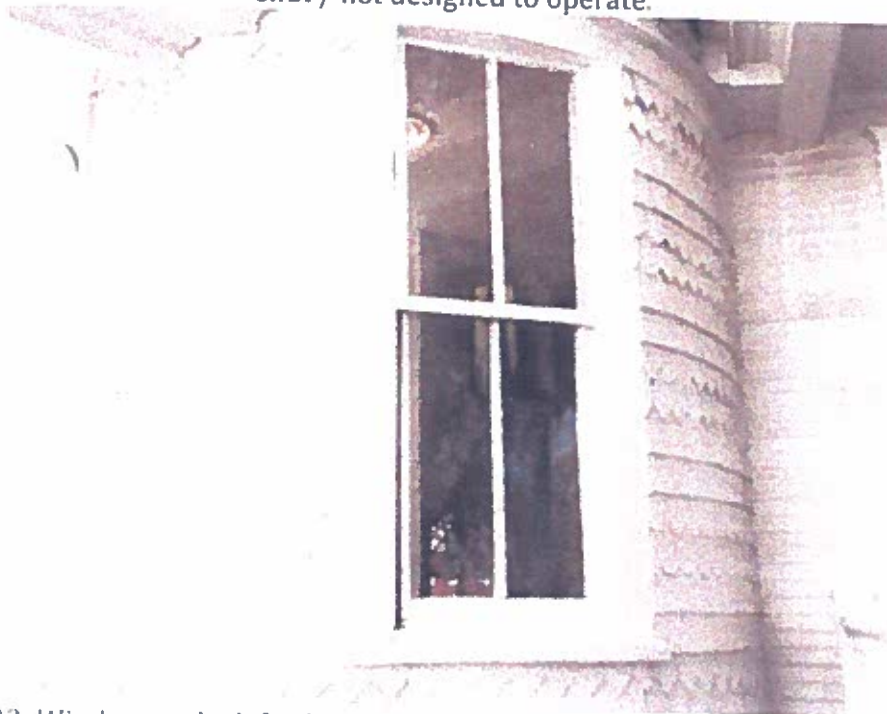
Window to the left of entrance door, facing approx.. north. Window panes appear modern. Paint shut.
